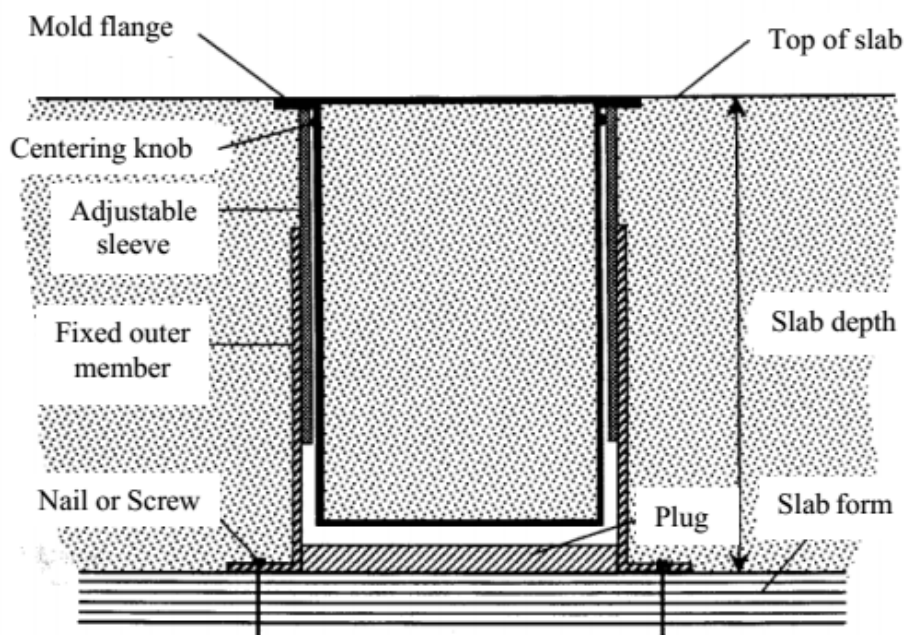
Cast in-place cylinder mold assembly (ASTM C 873/C 873M, 2004)
